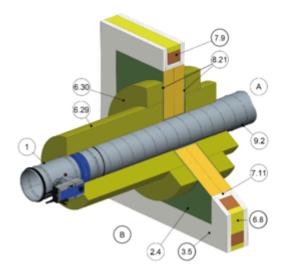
Dry mortarless installation remote from timber stud walls with mineral wool and fire batt
